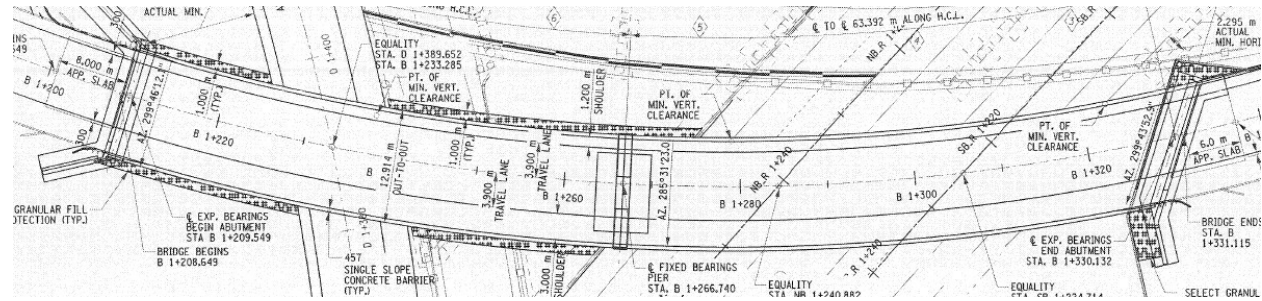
Plan View of I-290 Ramp B over I-290 Ramp D and I-190
